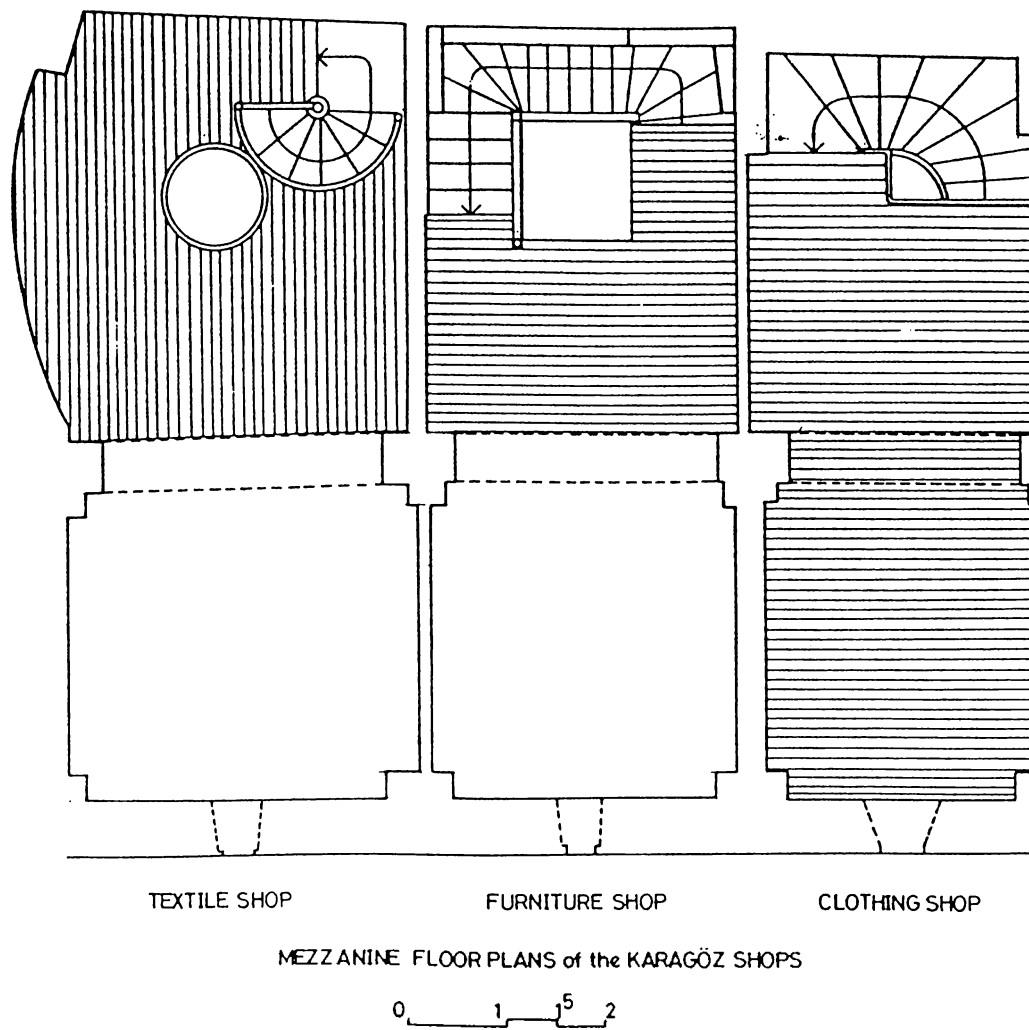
Mezzanine floor plans of the *Karagöz Shops
